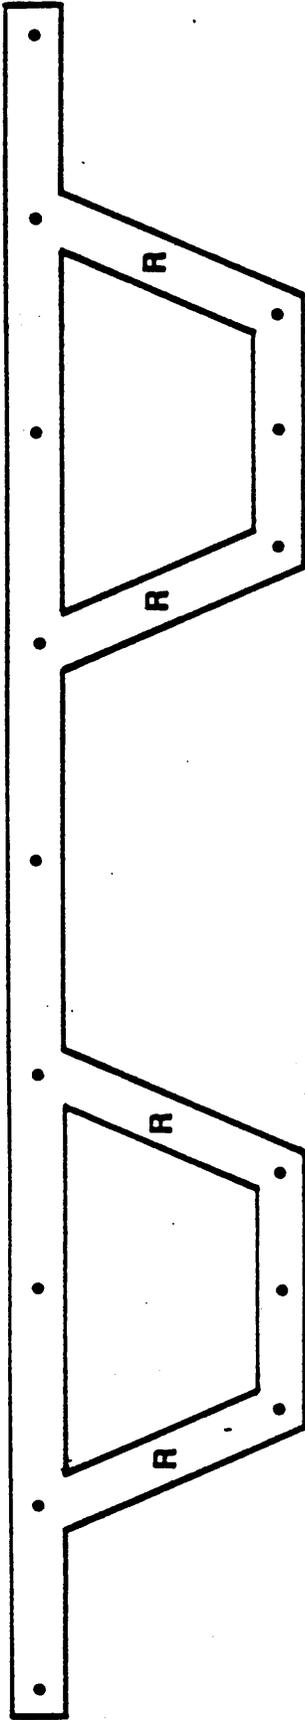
Section instrumentation -- typical for the two sections at quarter and mid-span.
